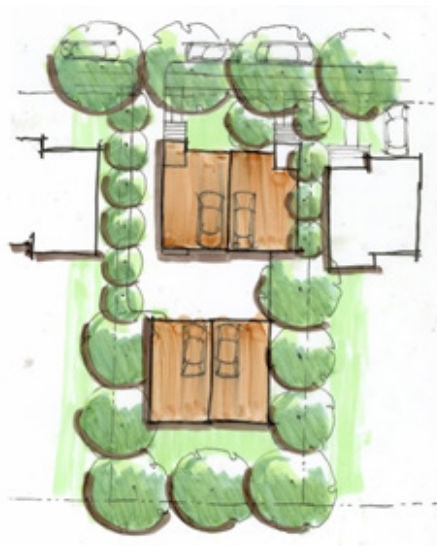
Illustrative example of street-facing townhouses with two rows of units on a single lot
